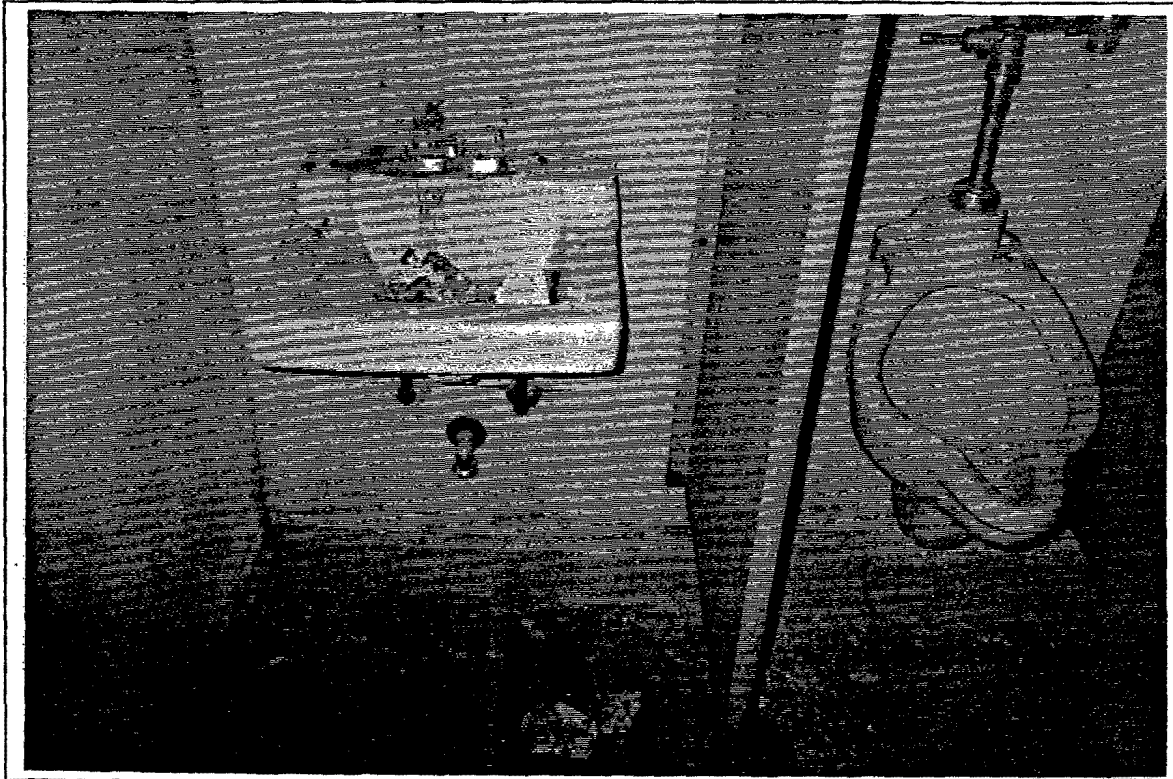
Building 30 - Men's bathroom area on building's east side. Note that non-asbestos plaster ceiling in this room has collapsed completely due to water intrusion from roof (Sample No. 1-024).
